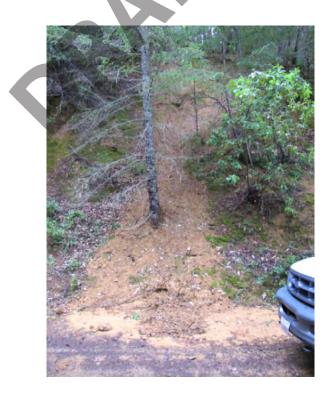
Looking south; fresh slide scarps, location 10 in the upper right corner of lower picture.
